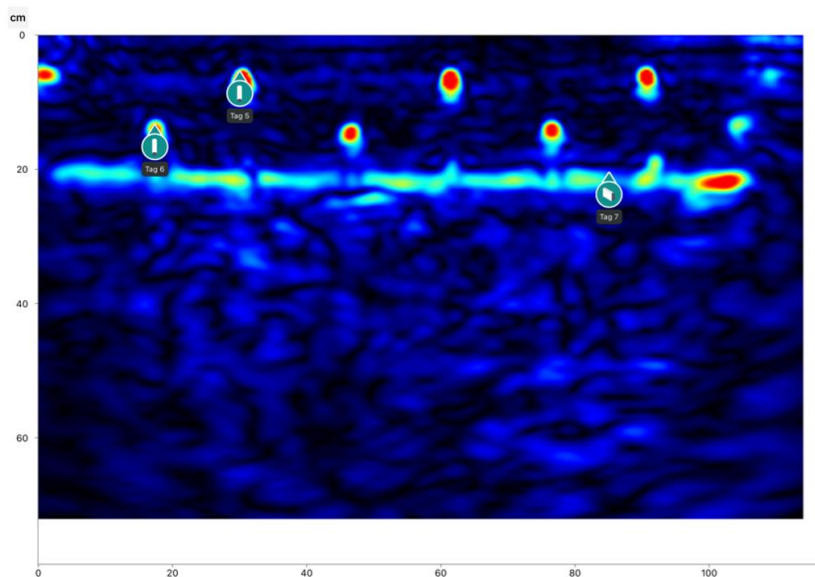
Sample of GPR cross section scan results for a cross wall in Langton House
